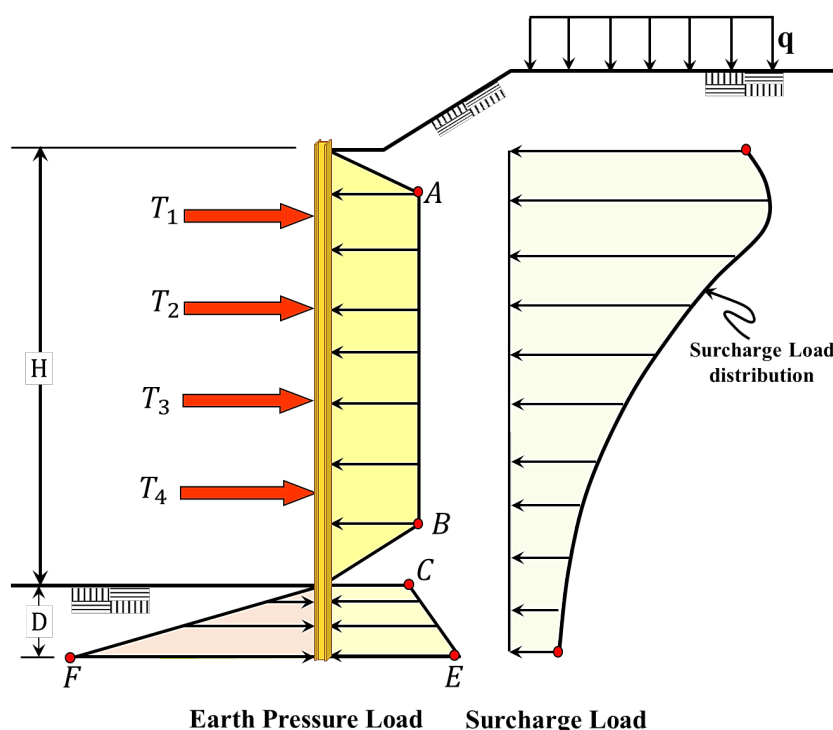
Pressure Diagram for Multi Ground Anchor Wall System with Boussinesq Load
